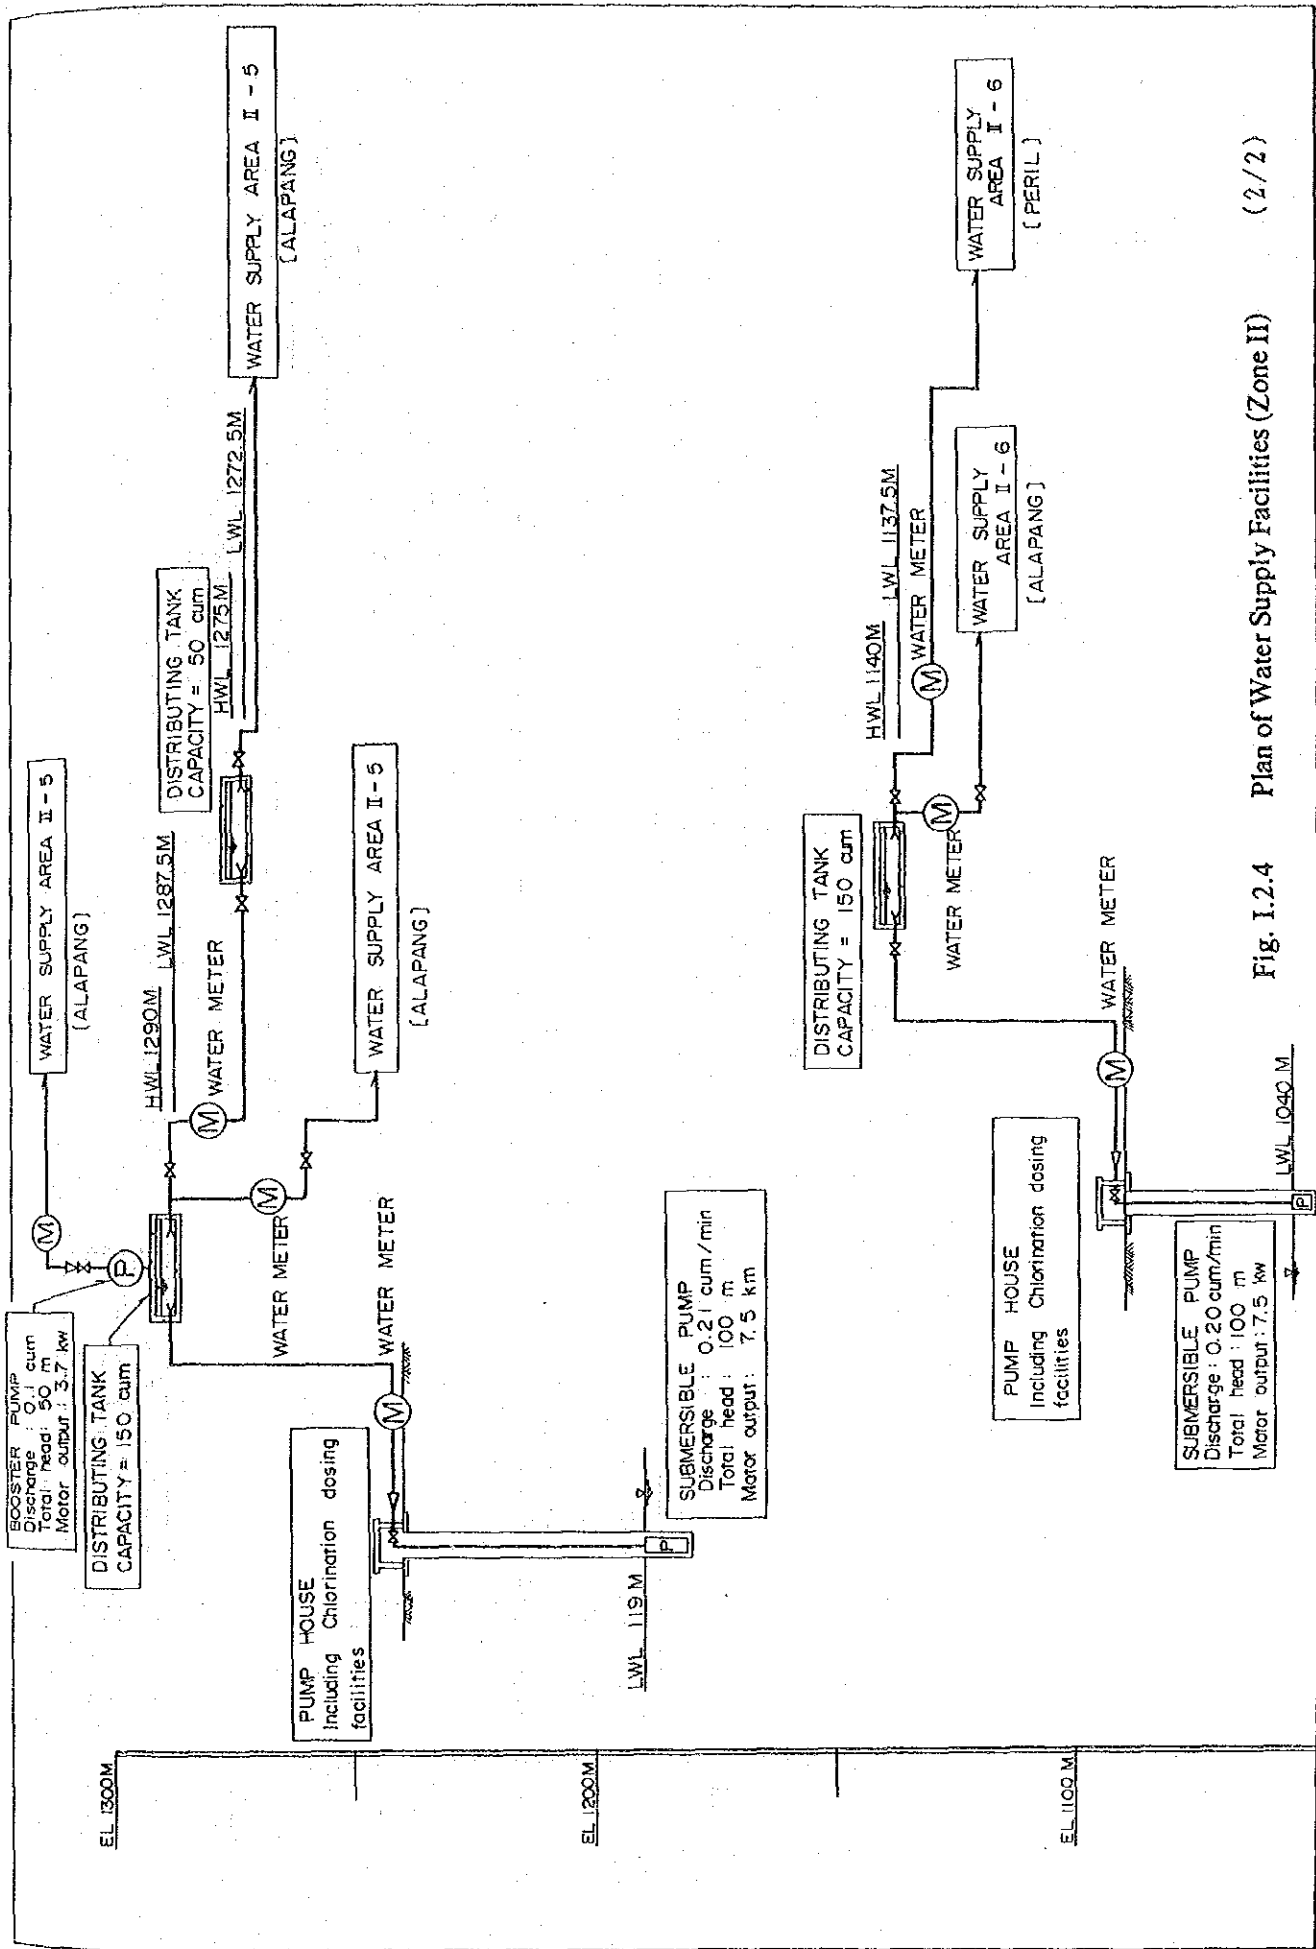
Plan of Water Supply Facilities (Zone II) (2/2)
